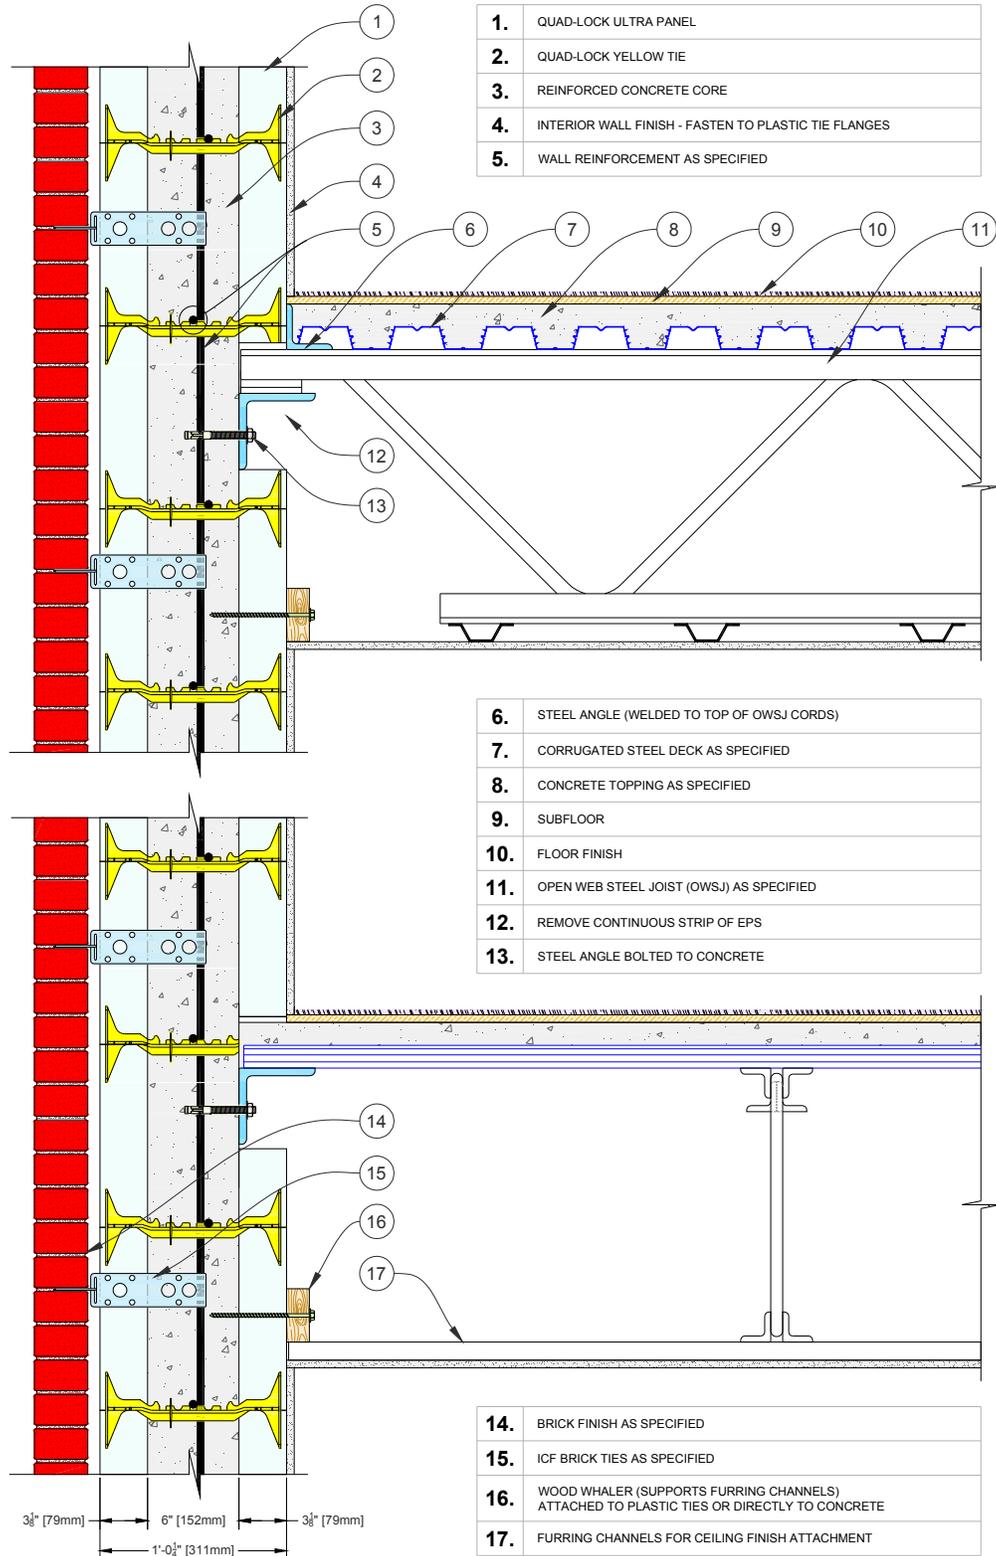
Typical Quad-Lock wall Connection to Composite Concrete and Steel Deck Slab Floor with Steel Joists
